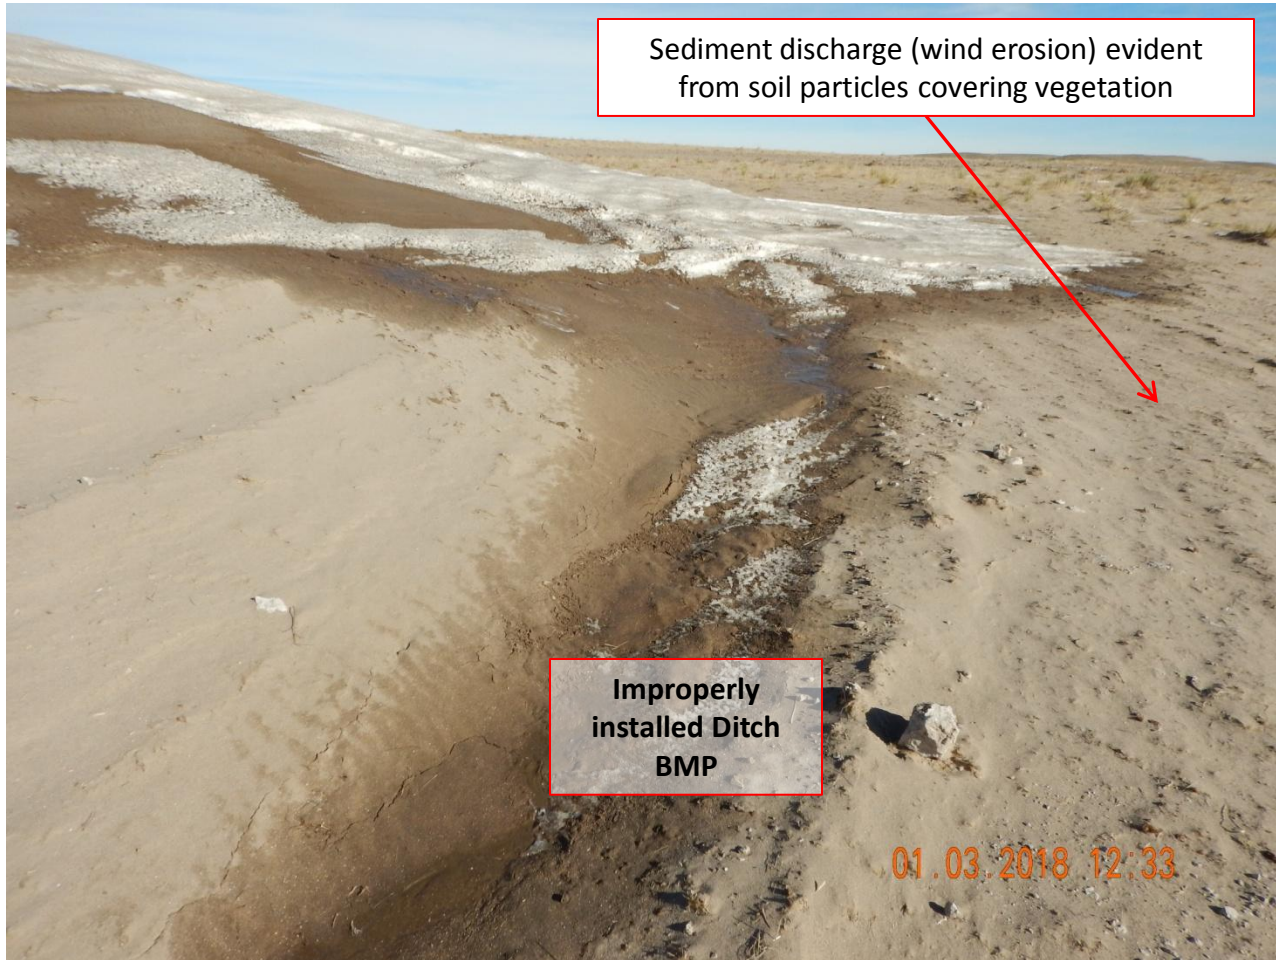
Photo taken from the southeast location, facing North on January 3, 2018. See comments under Photo 9.
